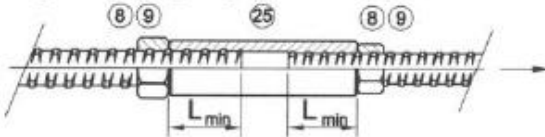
Coupler, standard Ø12 - 50; thread coupler Ø12 - 32
